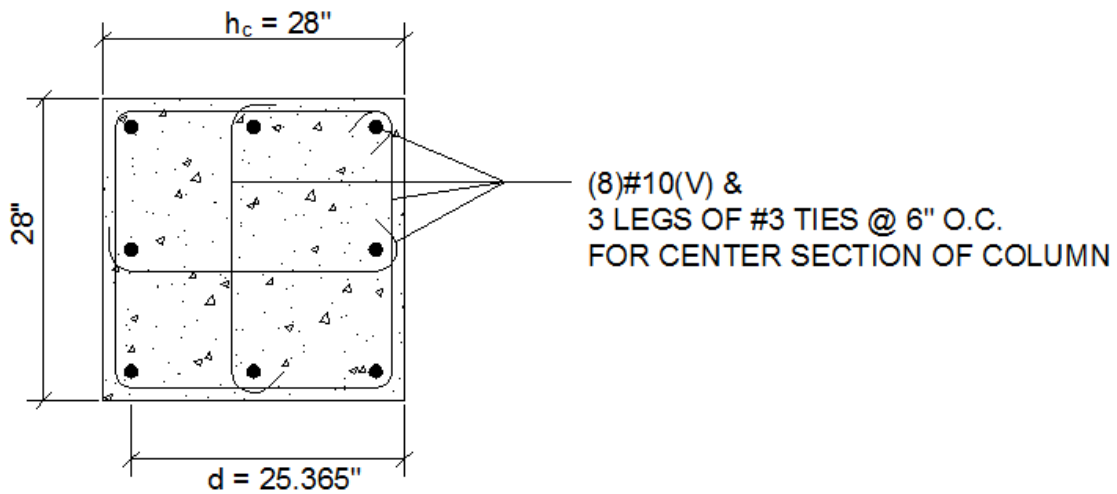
Exterior column, cross-section at center of column at ground floor level based on SDC D design.
